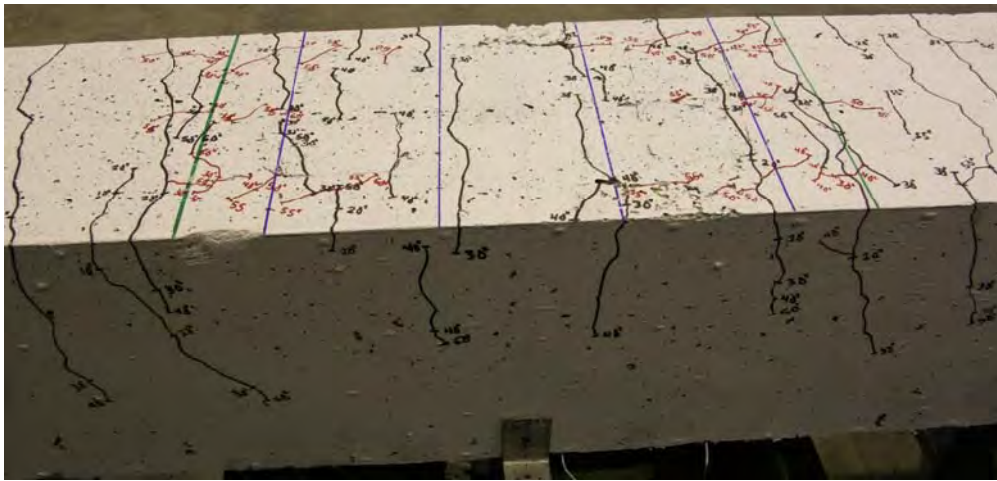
Photo. Side and top face of Beam A11-ST before failure.
